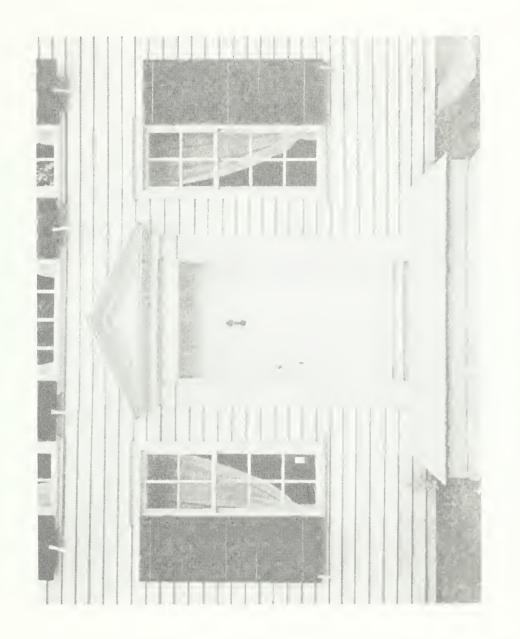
Schuyler House: Restored west façade, front entrance D101 (1963).
